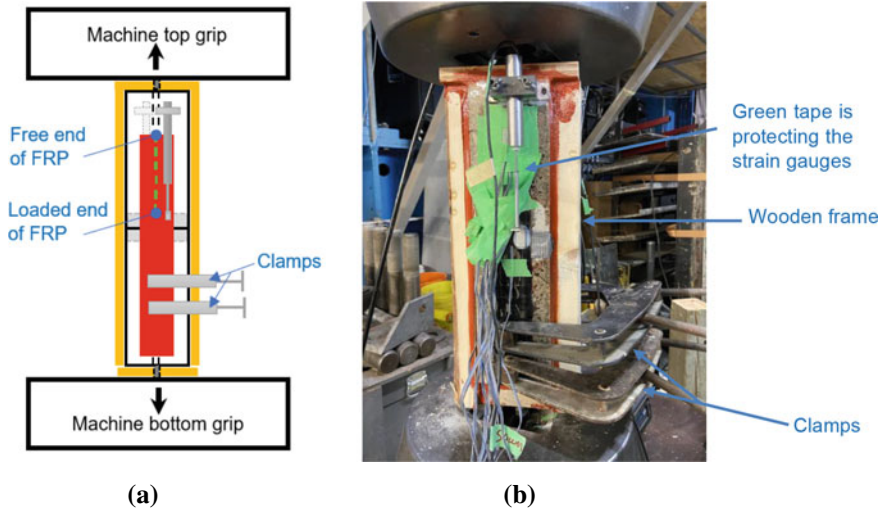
a FRP-Concrete Bond Setup Schematic, b FRP-Concrete Bond Test Setup
